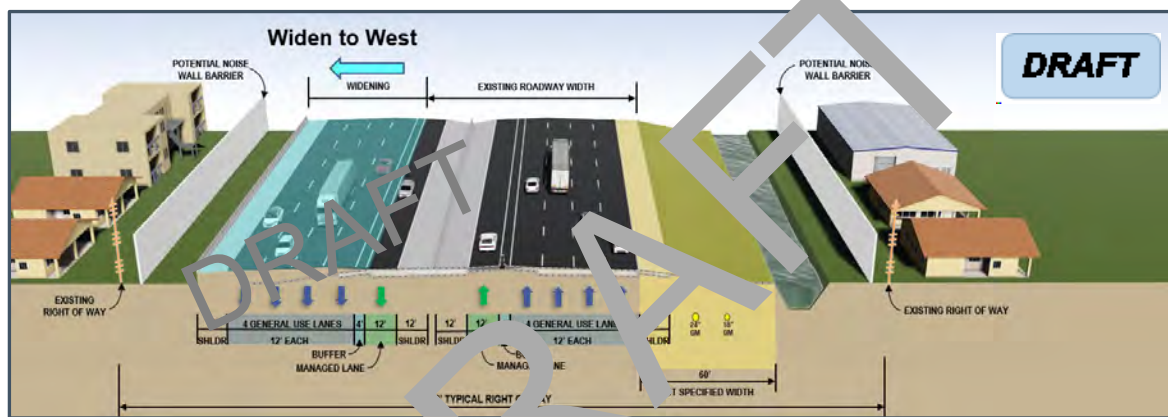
Proposed Typical Section (South of Atlantic Boulevard to Wiles Road)
